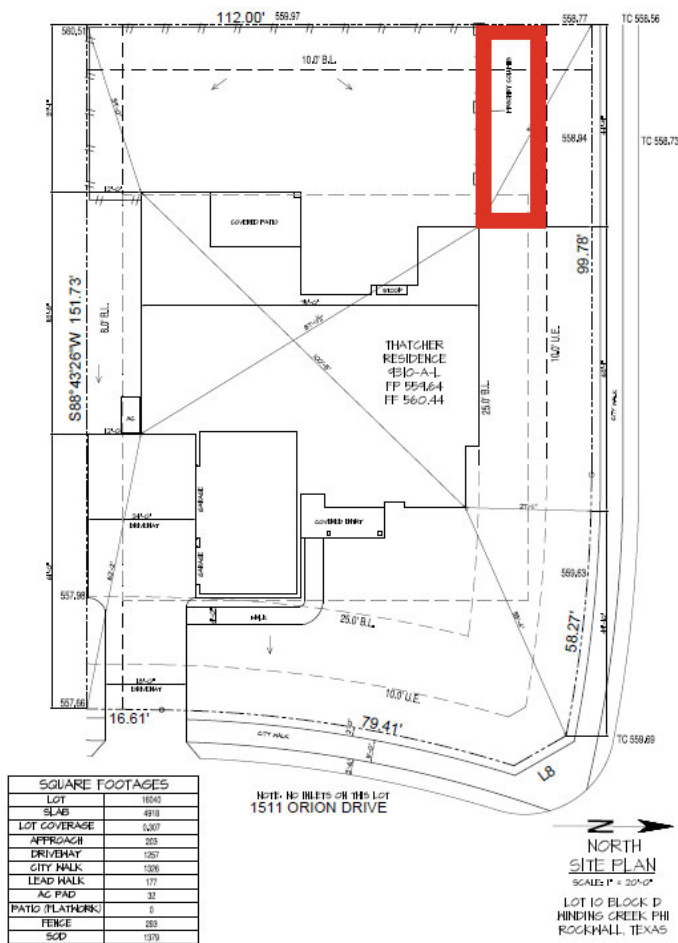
APPLICANT'S PLOT PLAN AND REQUEST
